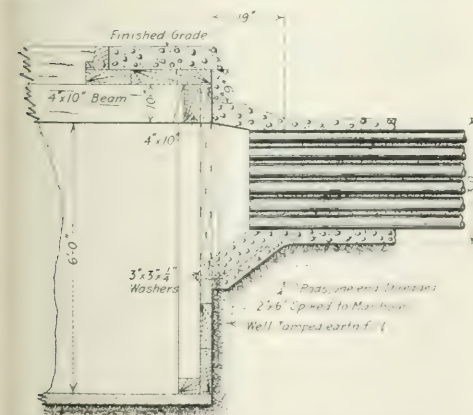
SECTIONAL ELEVATION OF MANHOLE
